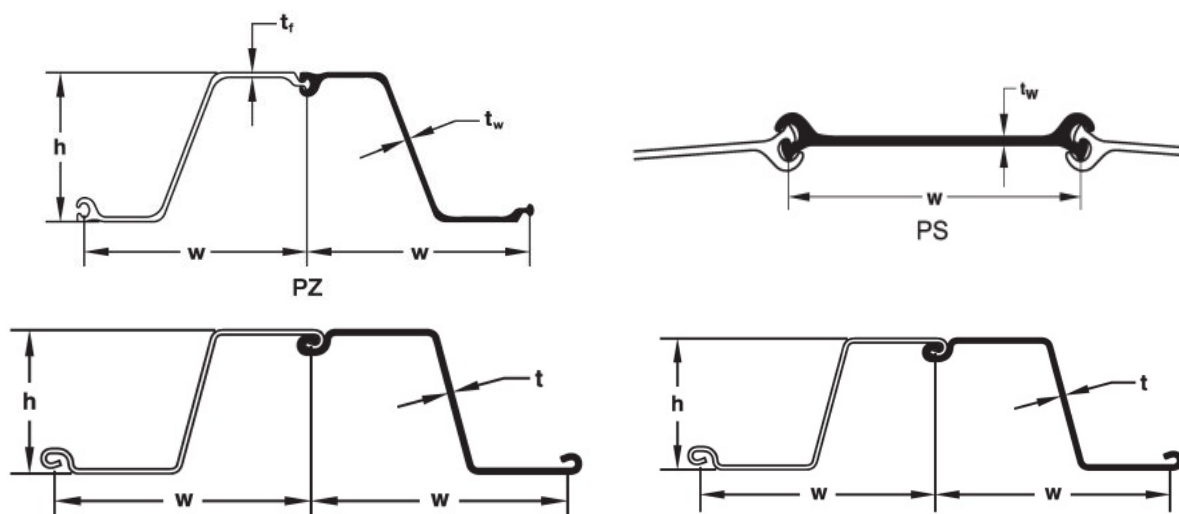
Typical Steel Sheet-Piling Sections ⁽³⁴⁾
